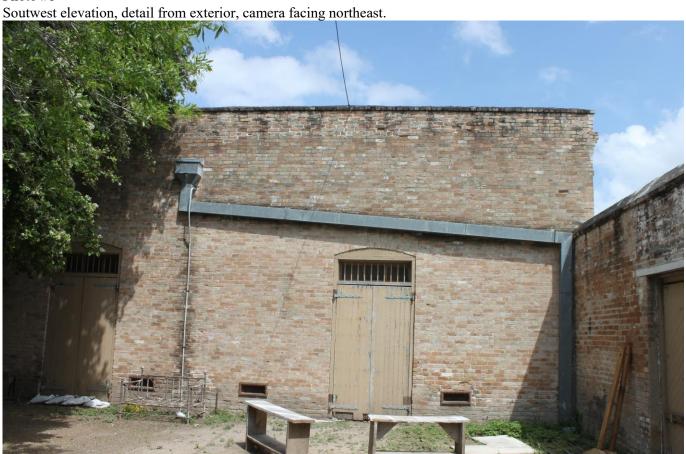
Vertical wood plank patio doors, barred transom, and segmental brick arch. Detail from exterior.
